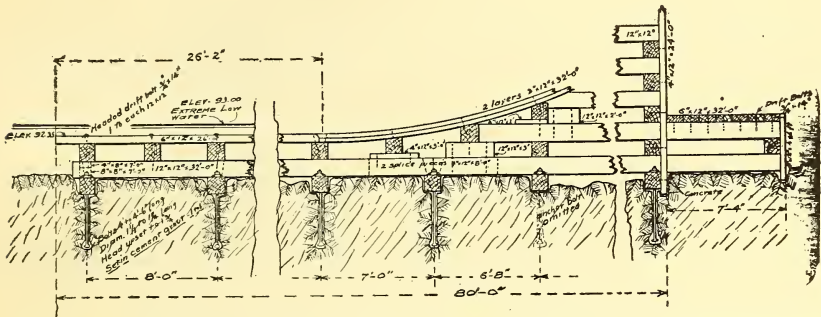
Foundation of Barber Lumber Co.'s Dam on Boise River, near Boise, Idaho.
